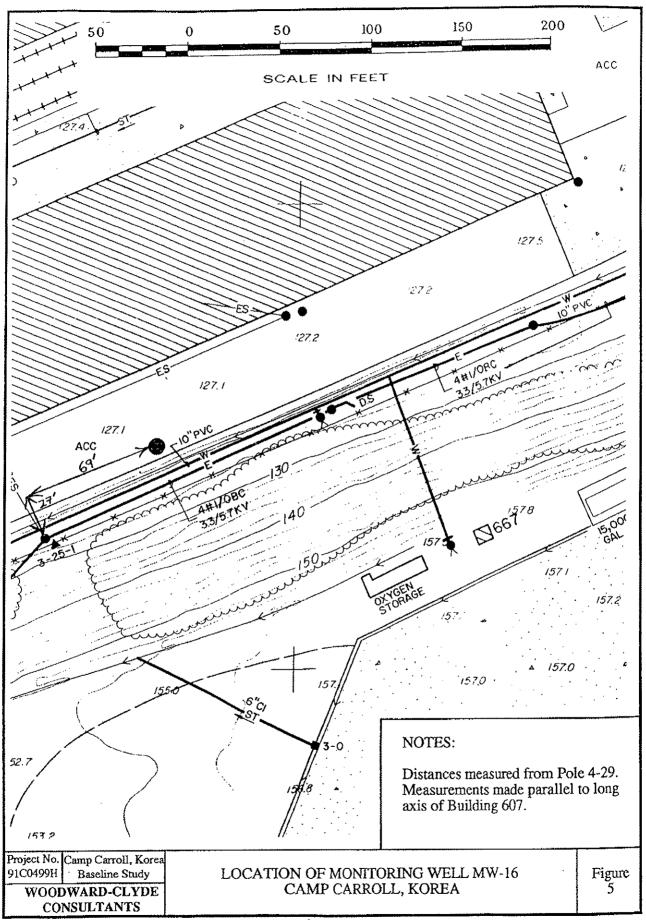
# DETAILED SITE LOCATIONS OF MONITORING WELLS
